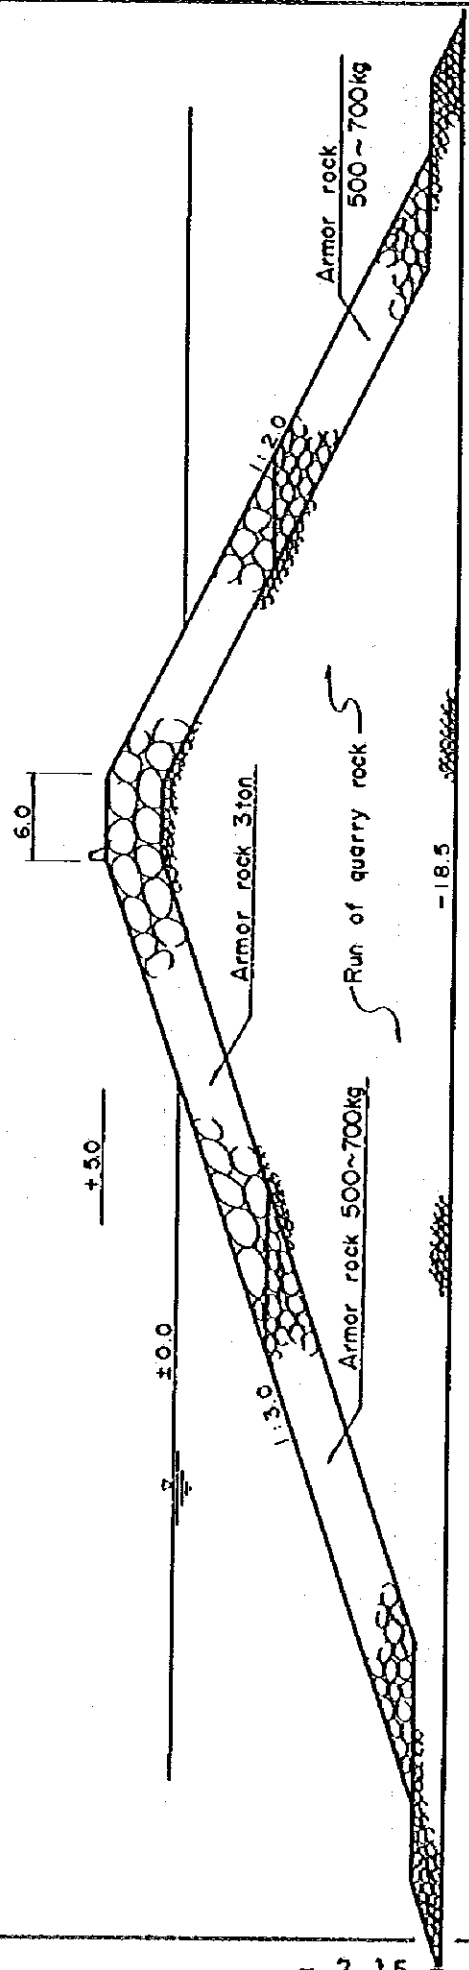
(2) TYPICAL SECTION OF BREAKWATER FOR ROBERTSPORT SITE / ALT. I
